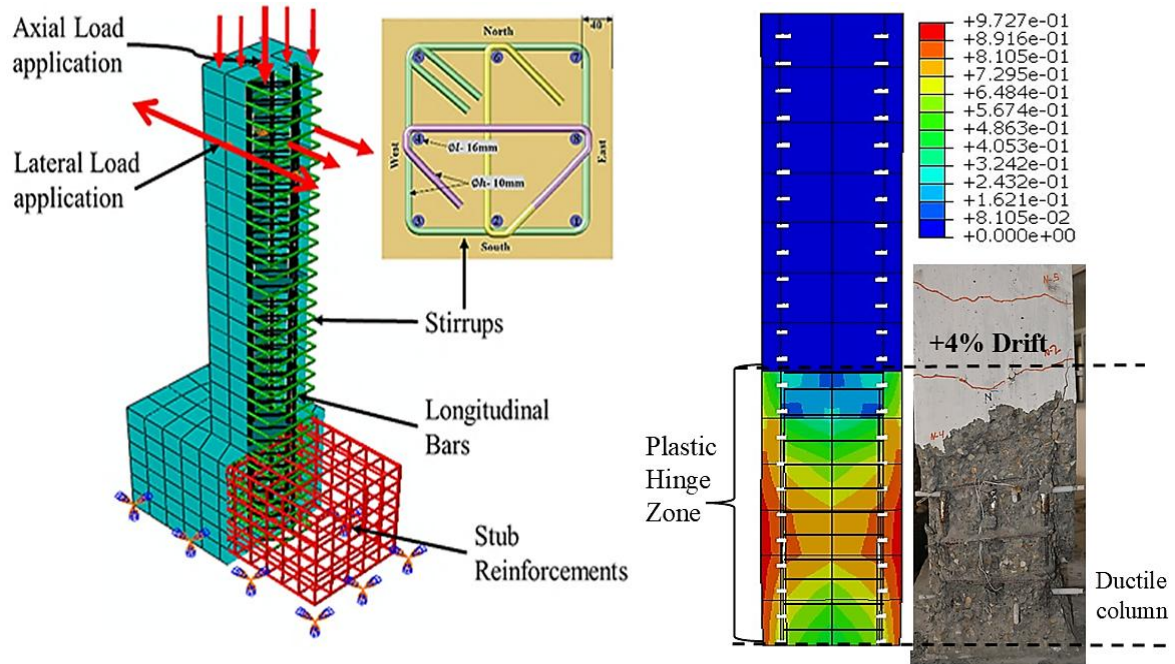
10 Schematic of 3D Numerical Model Ductile Column with Reinforcement Details
